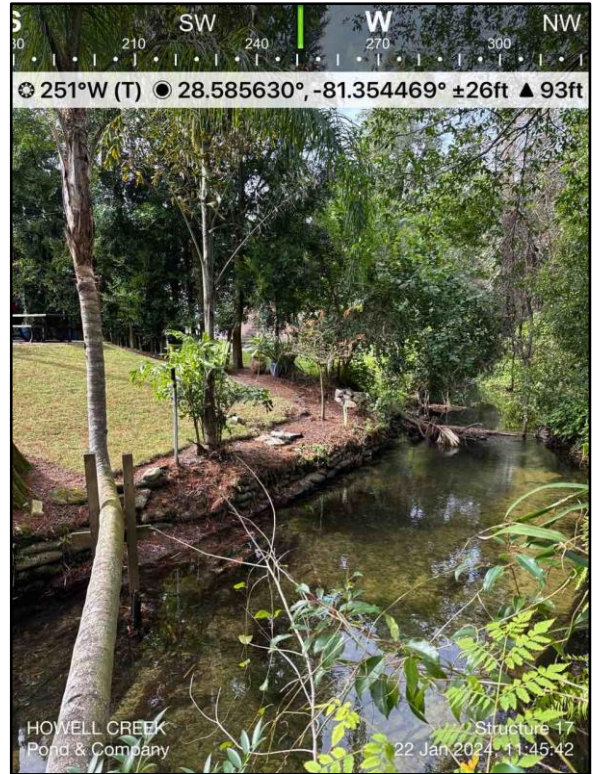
Structure 16; Rock Streambank Protection & Concrete Bag Wall (Priority 0)
